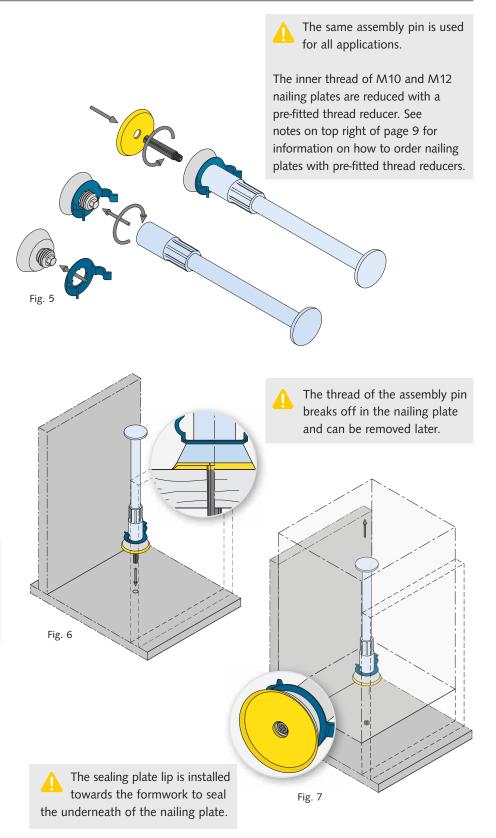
The assembly pin is screwed in the steel nailing plate; then the sealing plate is placed over the assembly pin.
